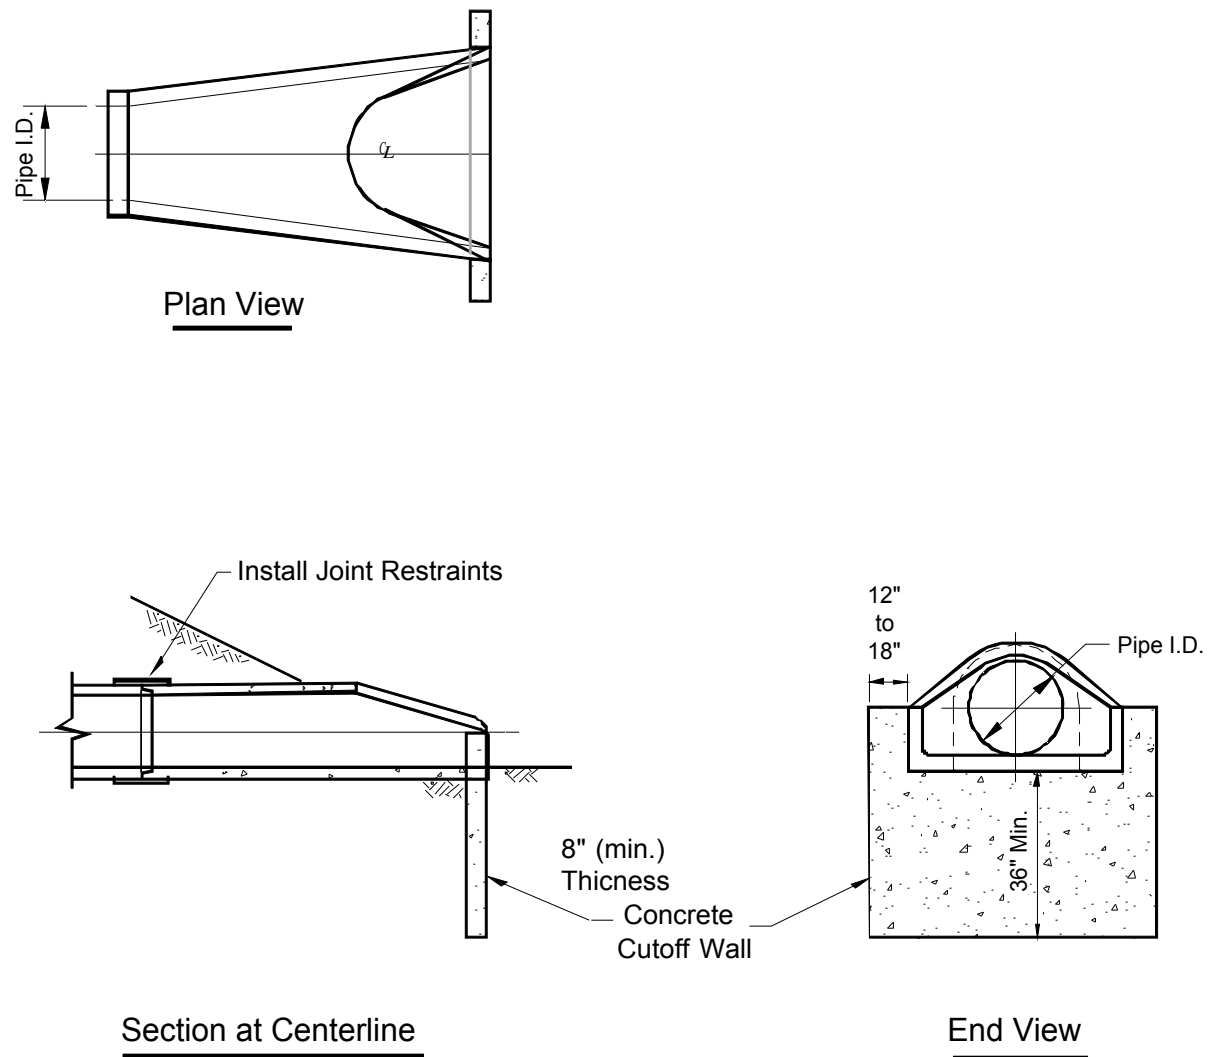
Concrete Flared End Section with Cutoff Wall for all Pipe Outlets
